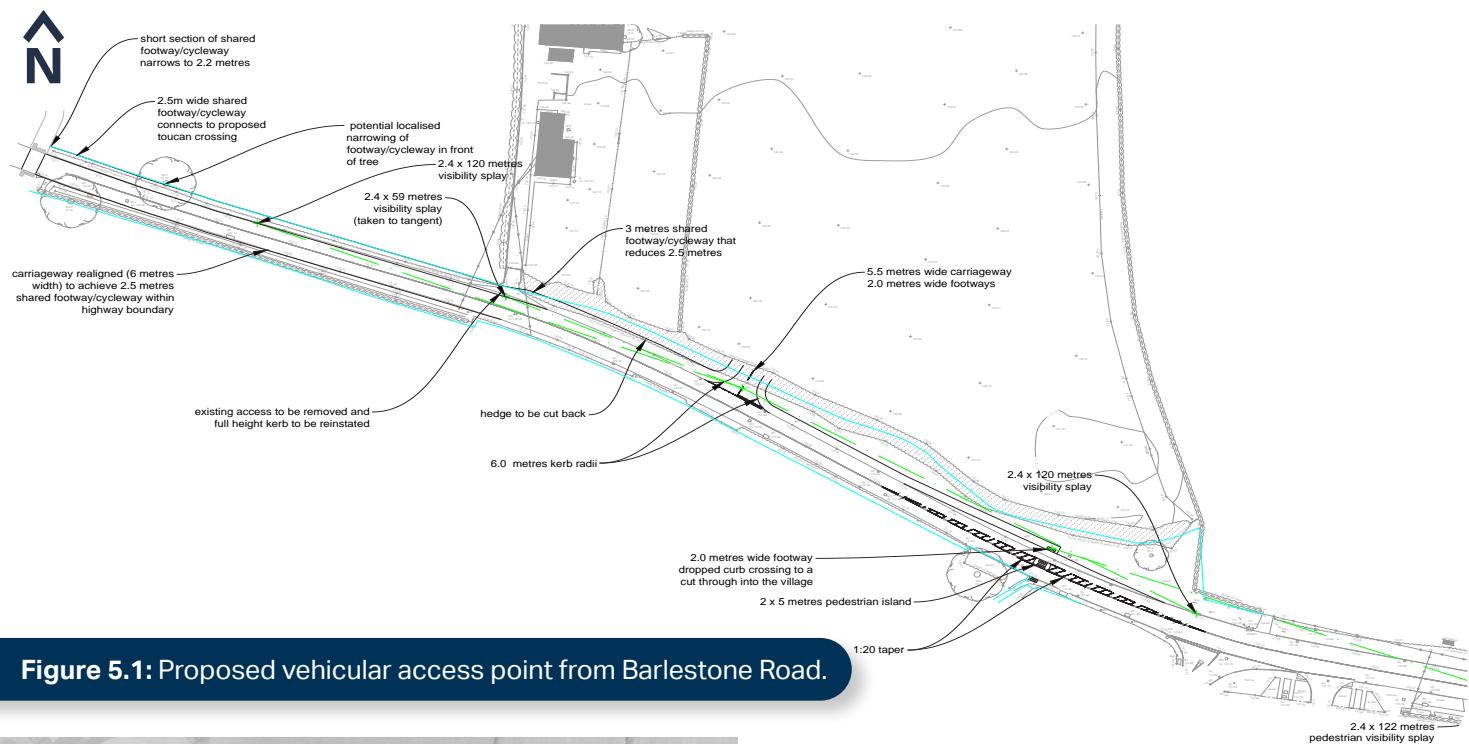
Proposed vehicular access point from Barlestone Road.
